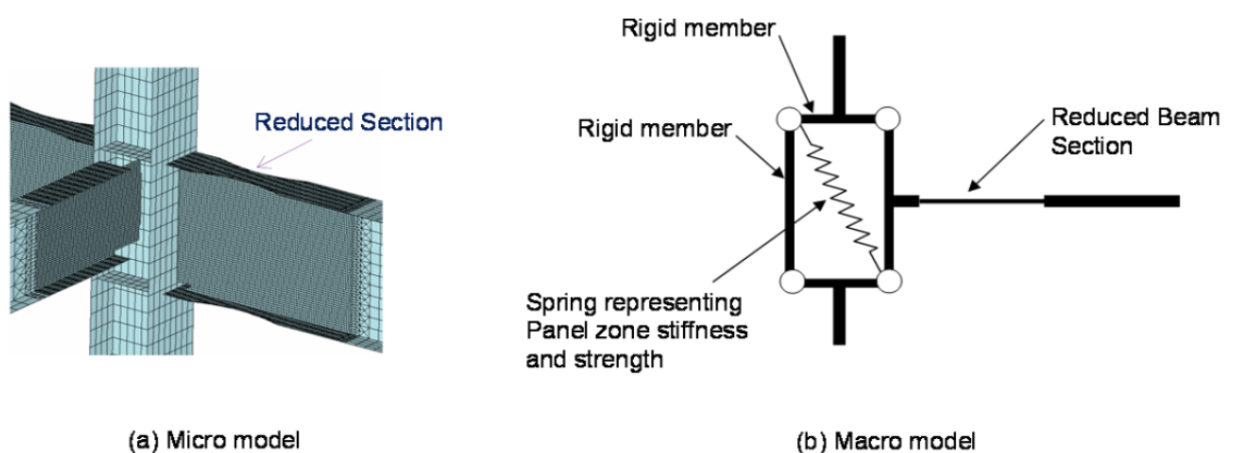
Subassembly model of a simple moment connection (Khandelwal et al, 2008, p.16)
